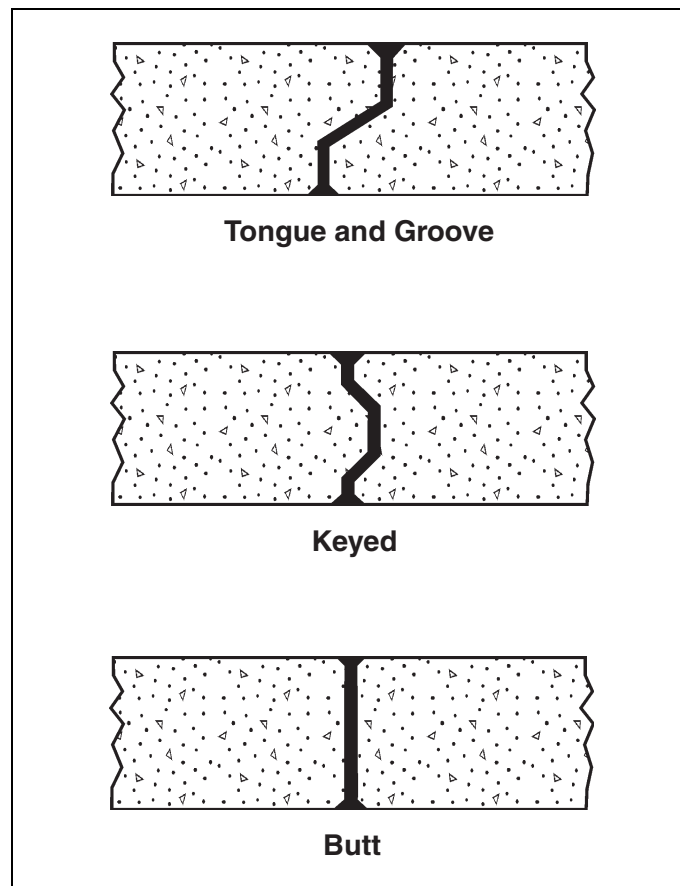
Tongue and groove, keyed and butt joints in reinforced concrete culverts.
